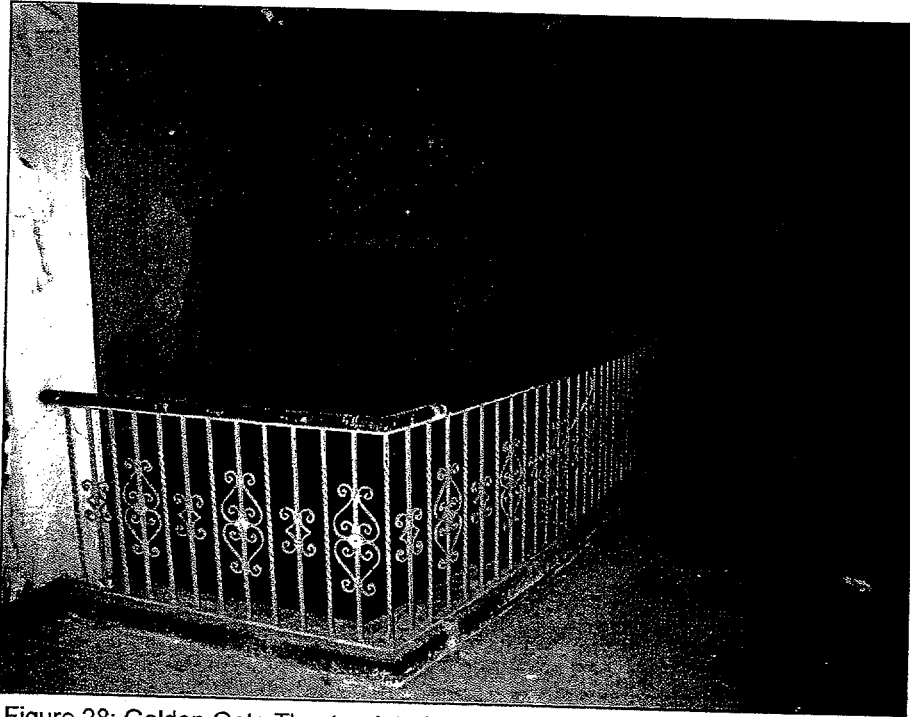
Golden Gate Theater, interior, view southwest from balcony looking toward stair from lobby (Chattel Architecture 2009)
